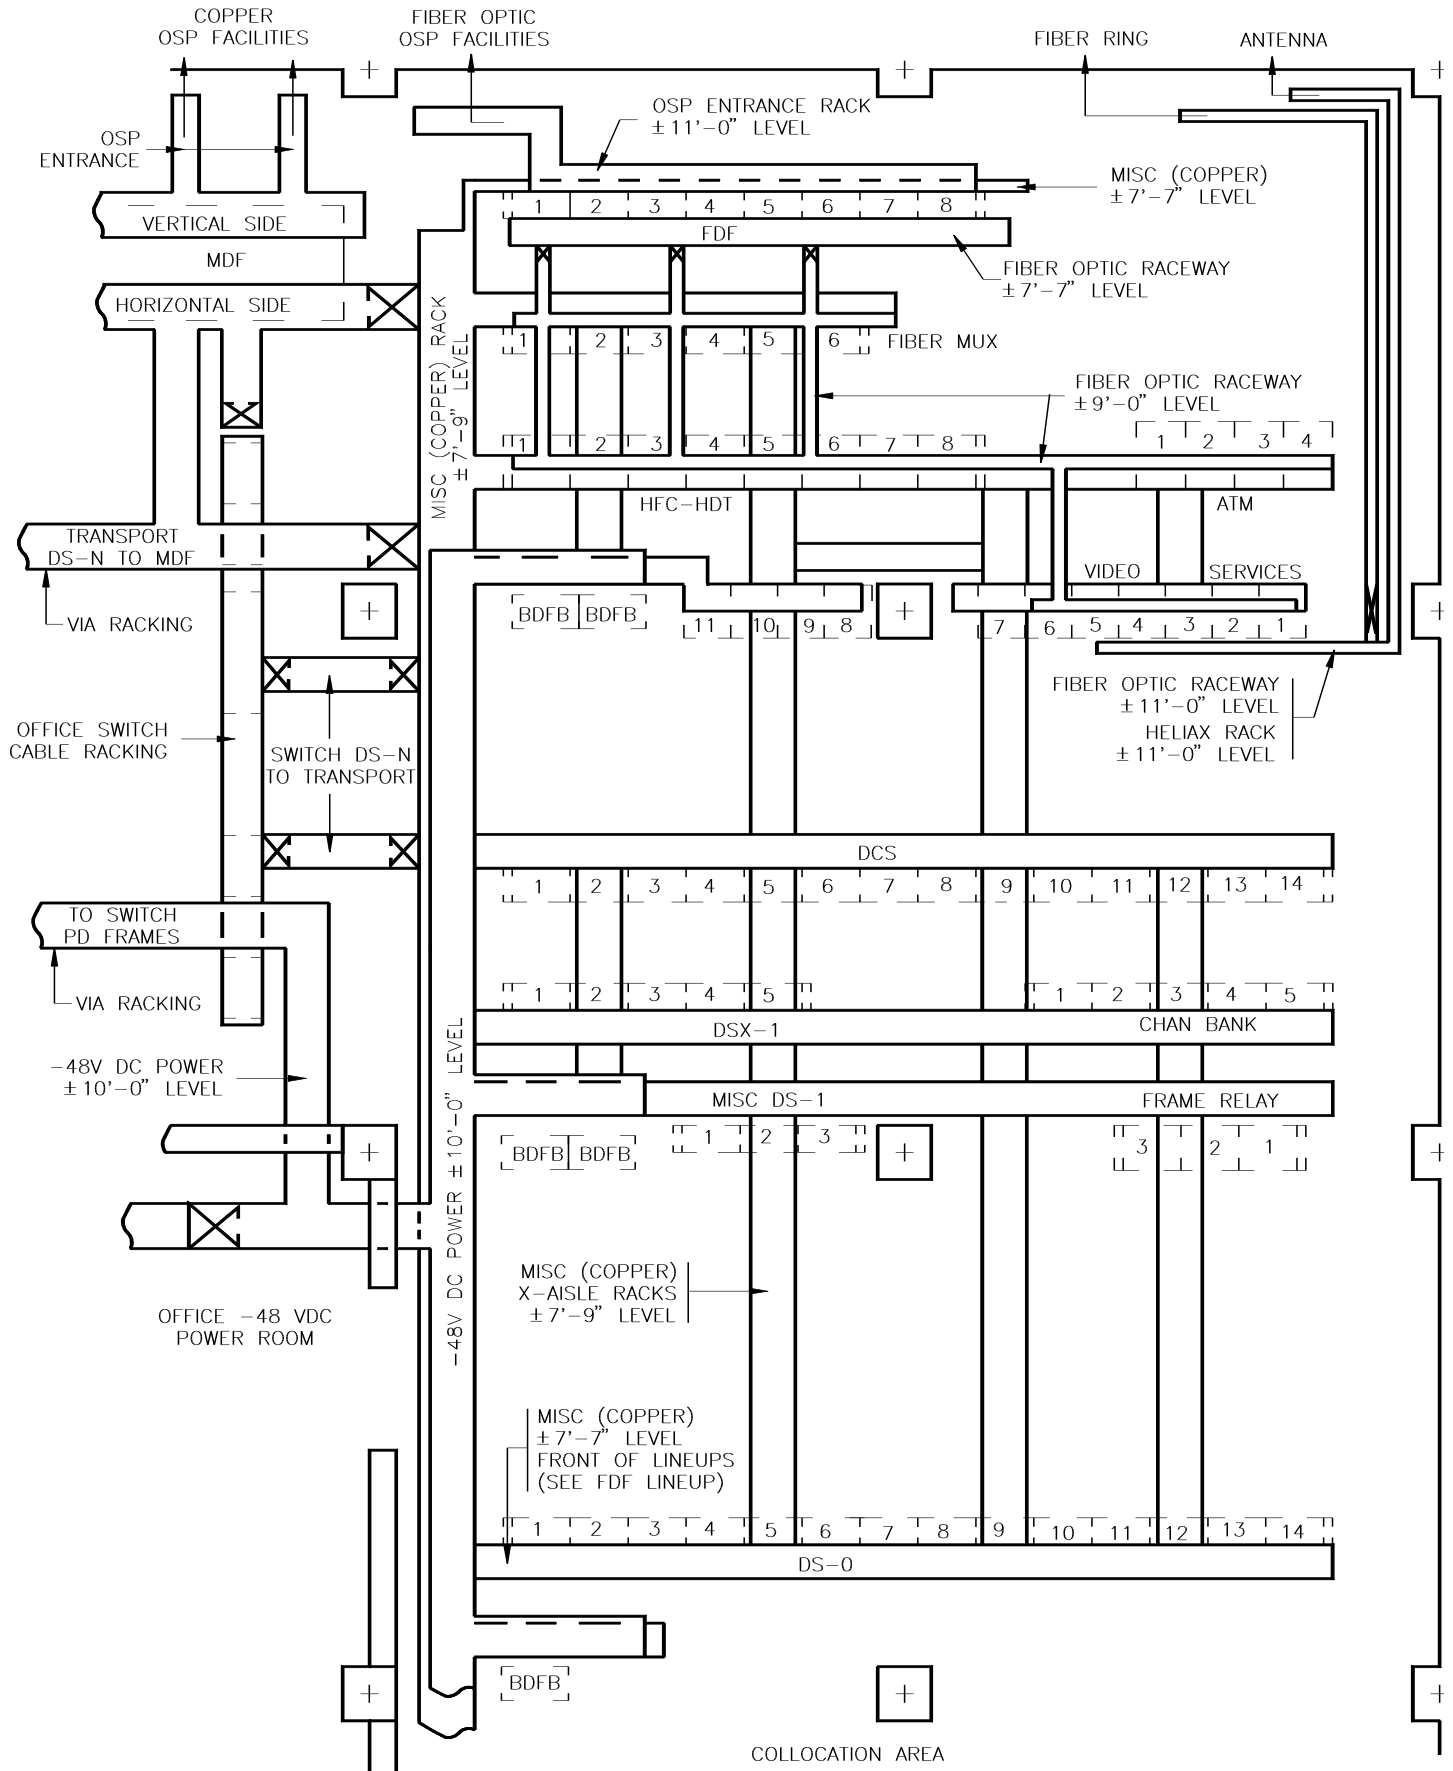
Typical Application Of Office Cable Racking To Figure 9-5 Floor Plan
